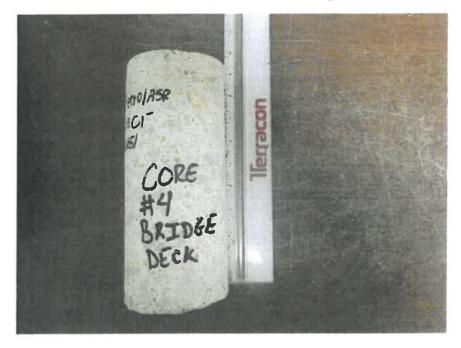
Core #4 from bridge deck (Lab No. 6651), as received.
